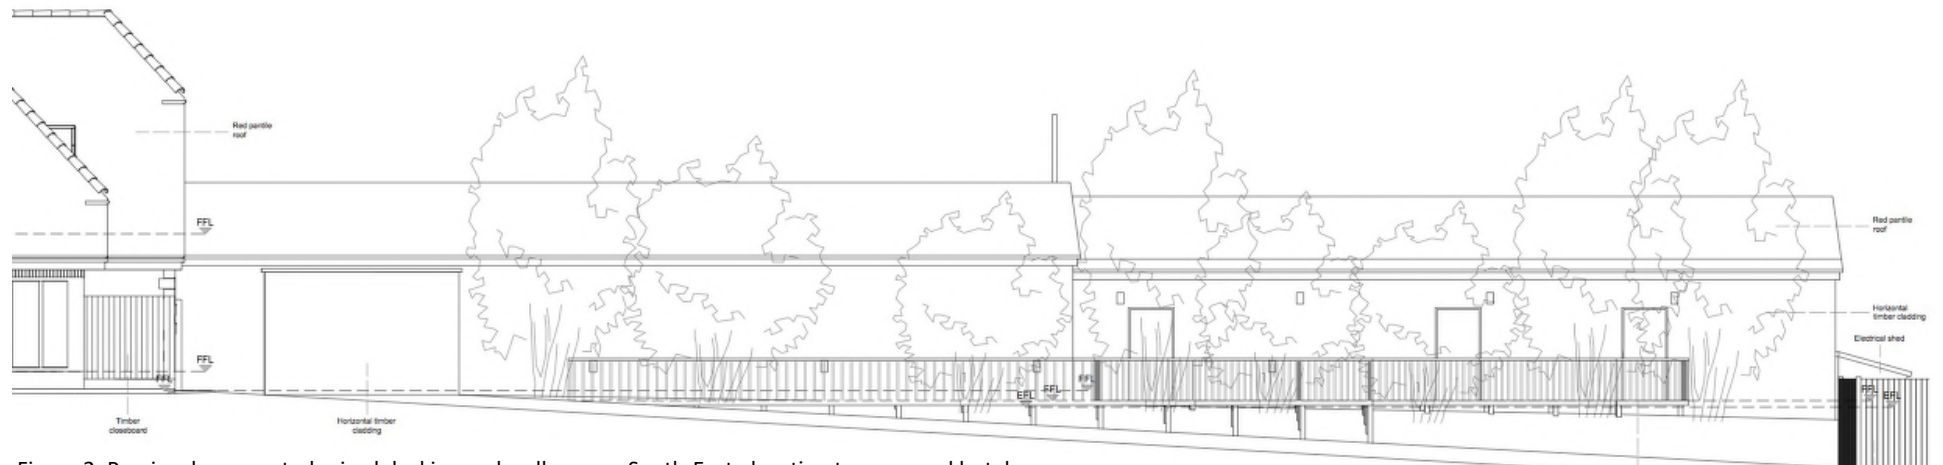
Previously consented raised decking and walkway on South-East elevation to proposed hotel rooms
